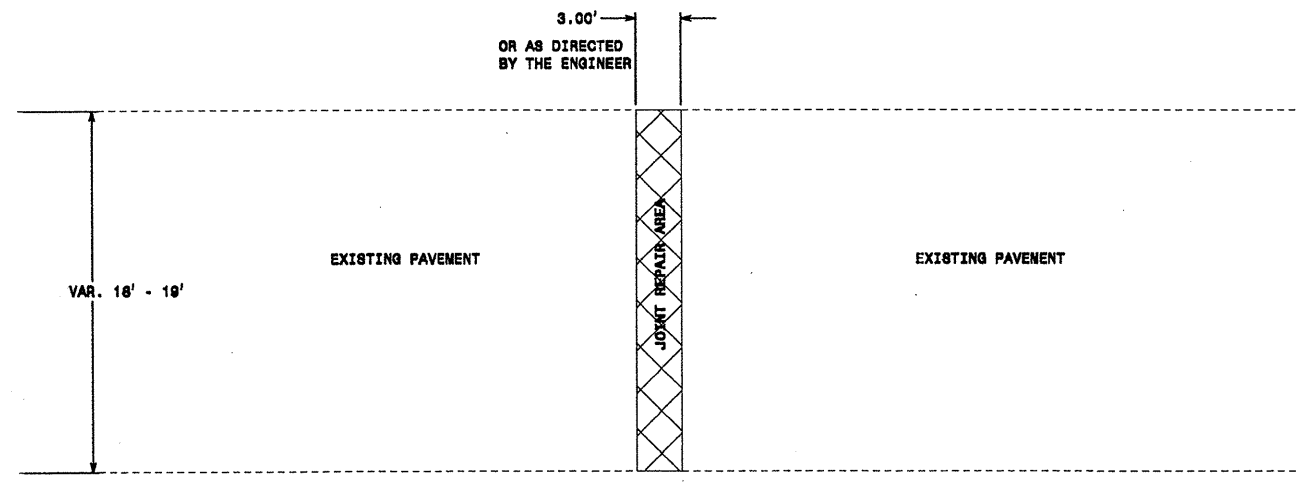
DETAILS OF PATCHING EXISTING PAVEMENT PRIOR TO RESURFACING
